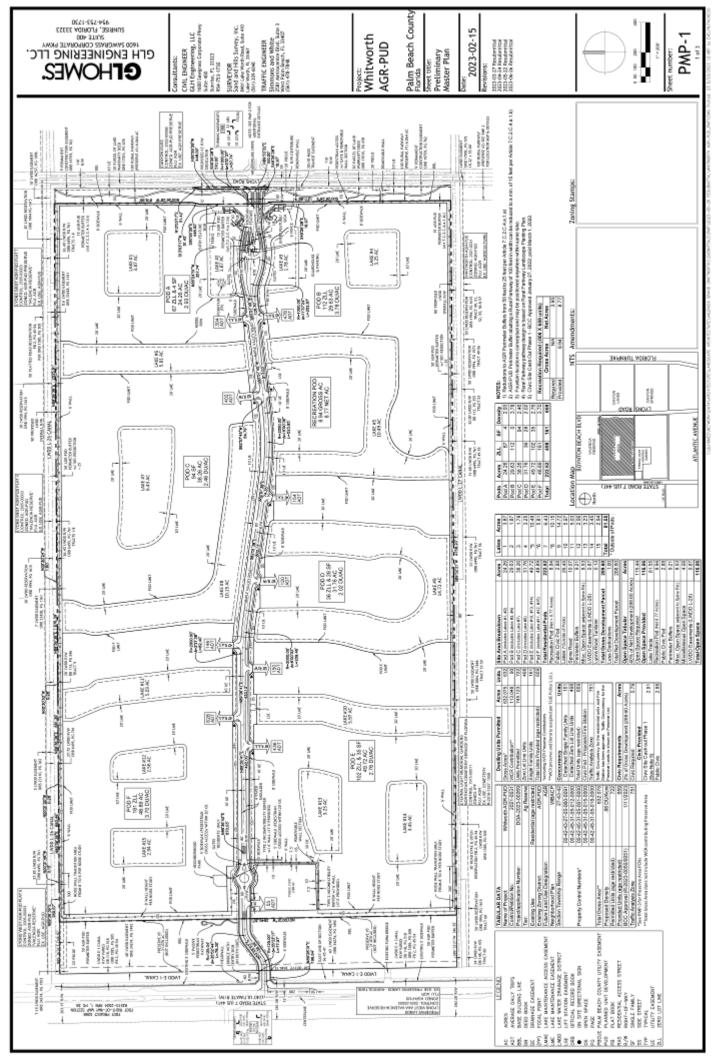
Preliminary Master Plan dated June 26, 2023 (page 1 of 3)
